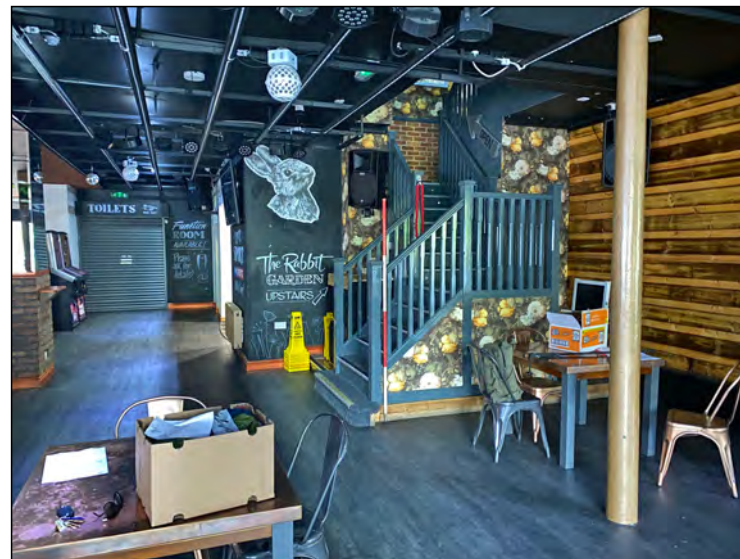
Interior ground floor, view looking NNW in the central area of The Rabbit.
